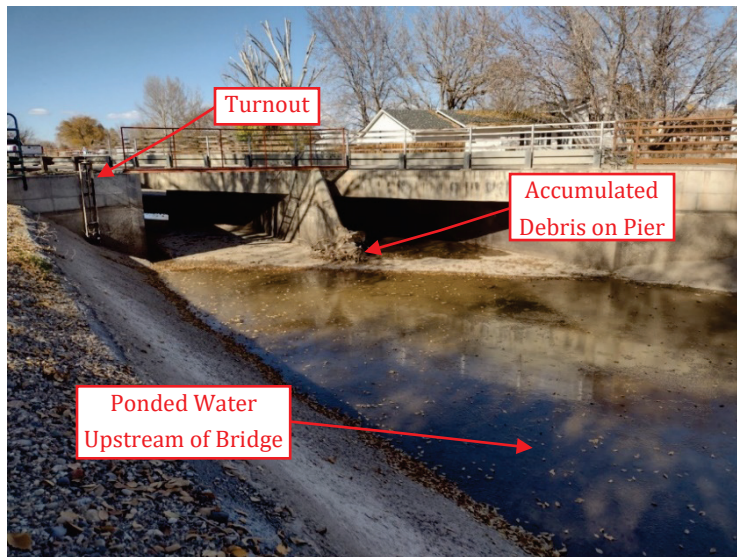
Existing Orchard Avenue Bridge Opening over Canal
